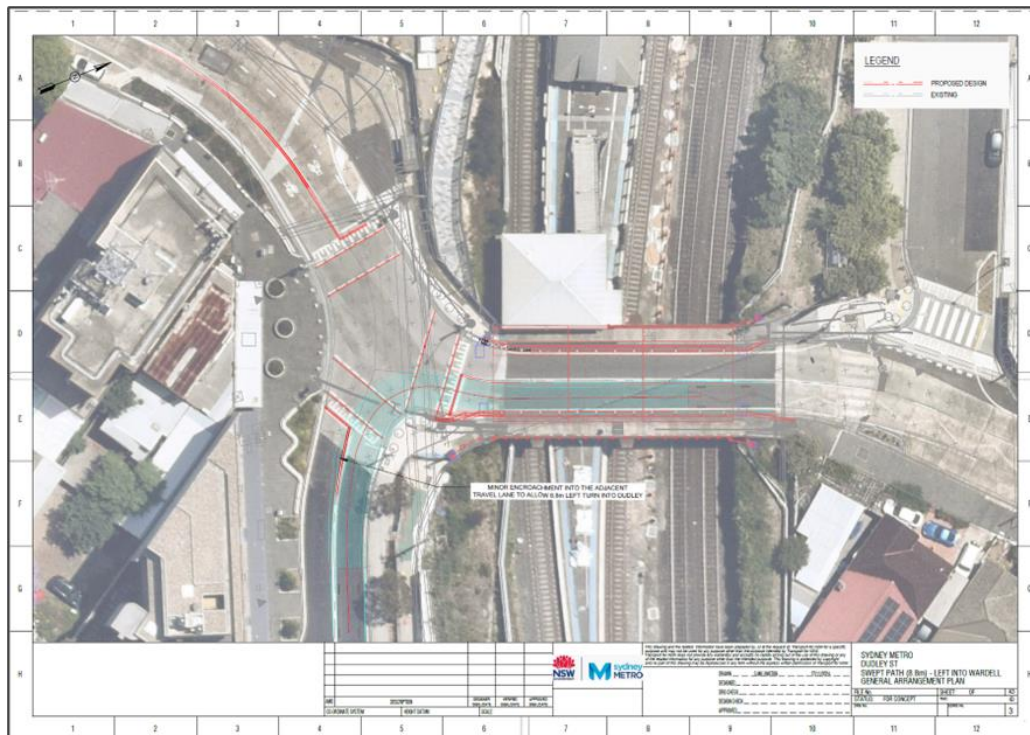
Turn paths with proposed road safety barriers for 8.8m long service vehicles turning left into Dudley Street from Wardell Road the overbridge.
